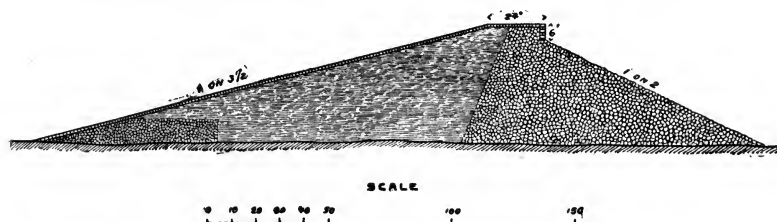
CROSS-SECTION OF PECOS DAM.
